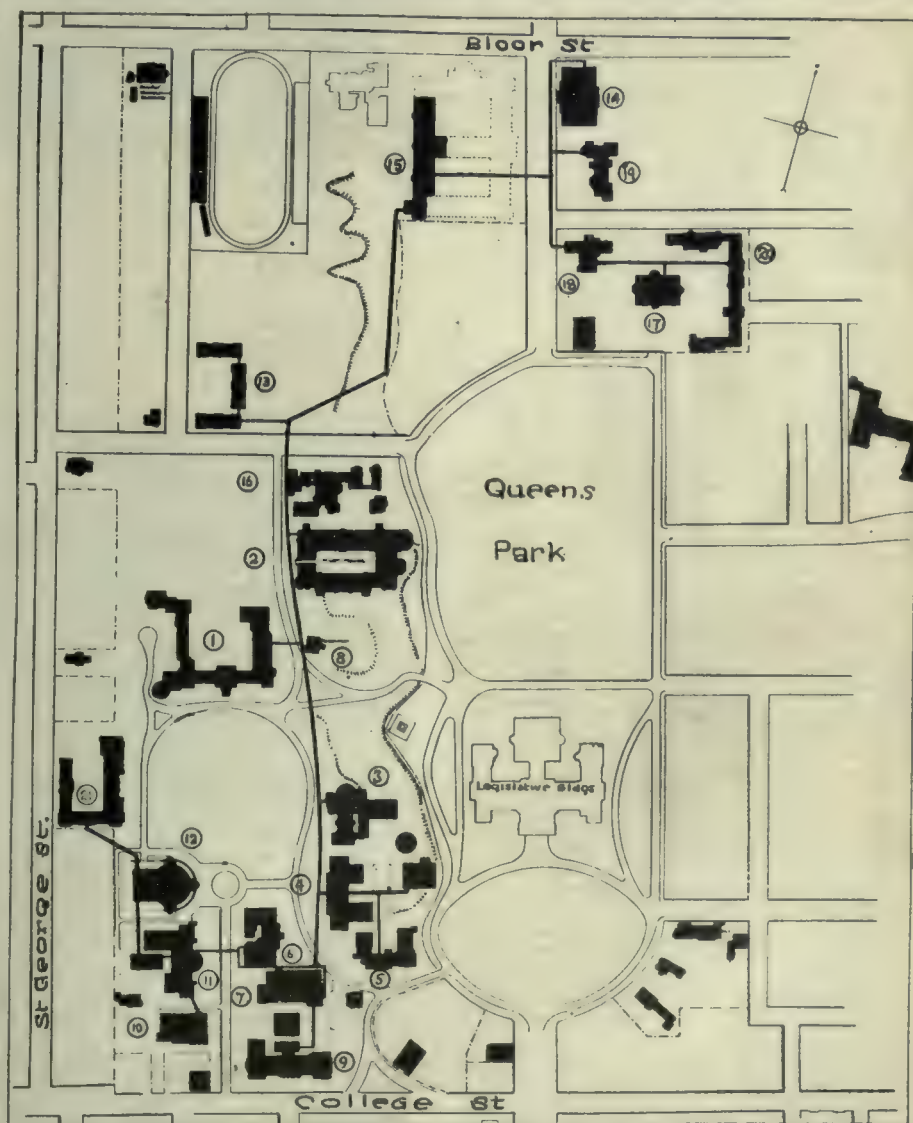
GROUND PLAN SHOWING LOCATION OF VARIOUS BUILDINGS SERVED BY CENTRAL PLANT
